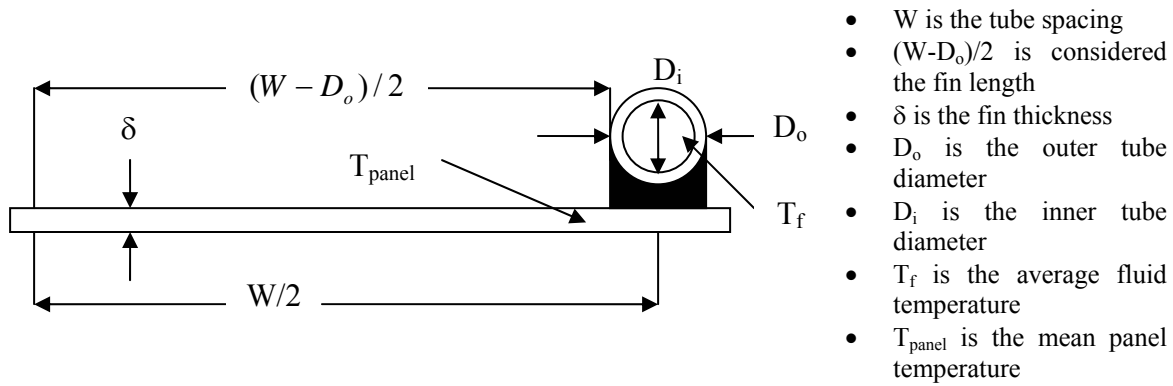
Radiant Panel Sheet and Tube Dimensions
